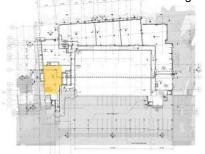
| Ground Floor Lighting Layout - Lower Level Lobby + E-Lounge
